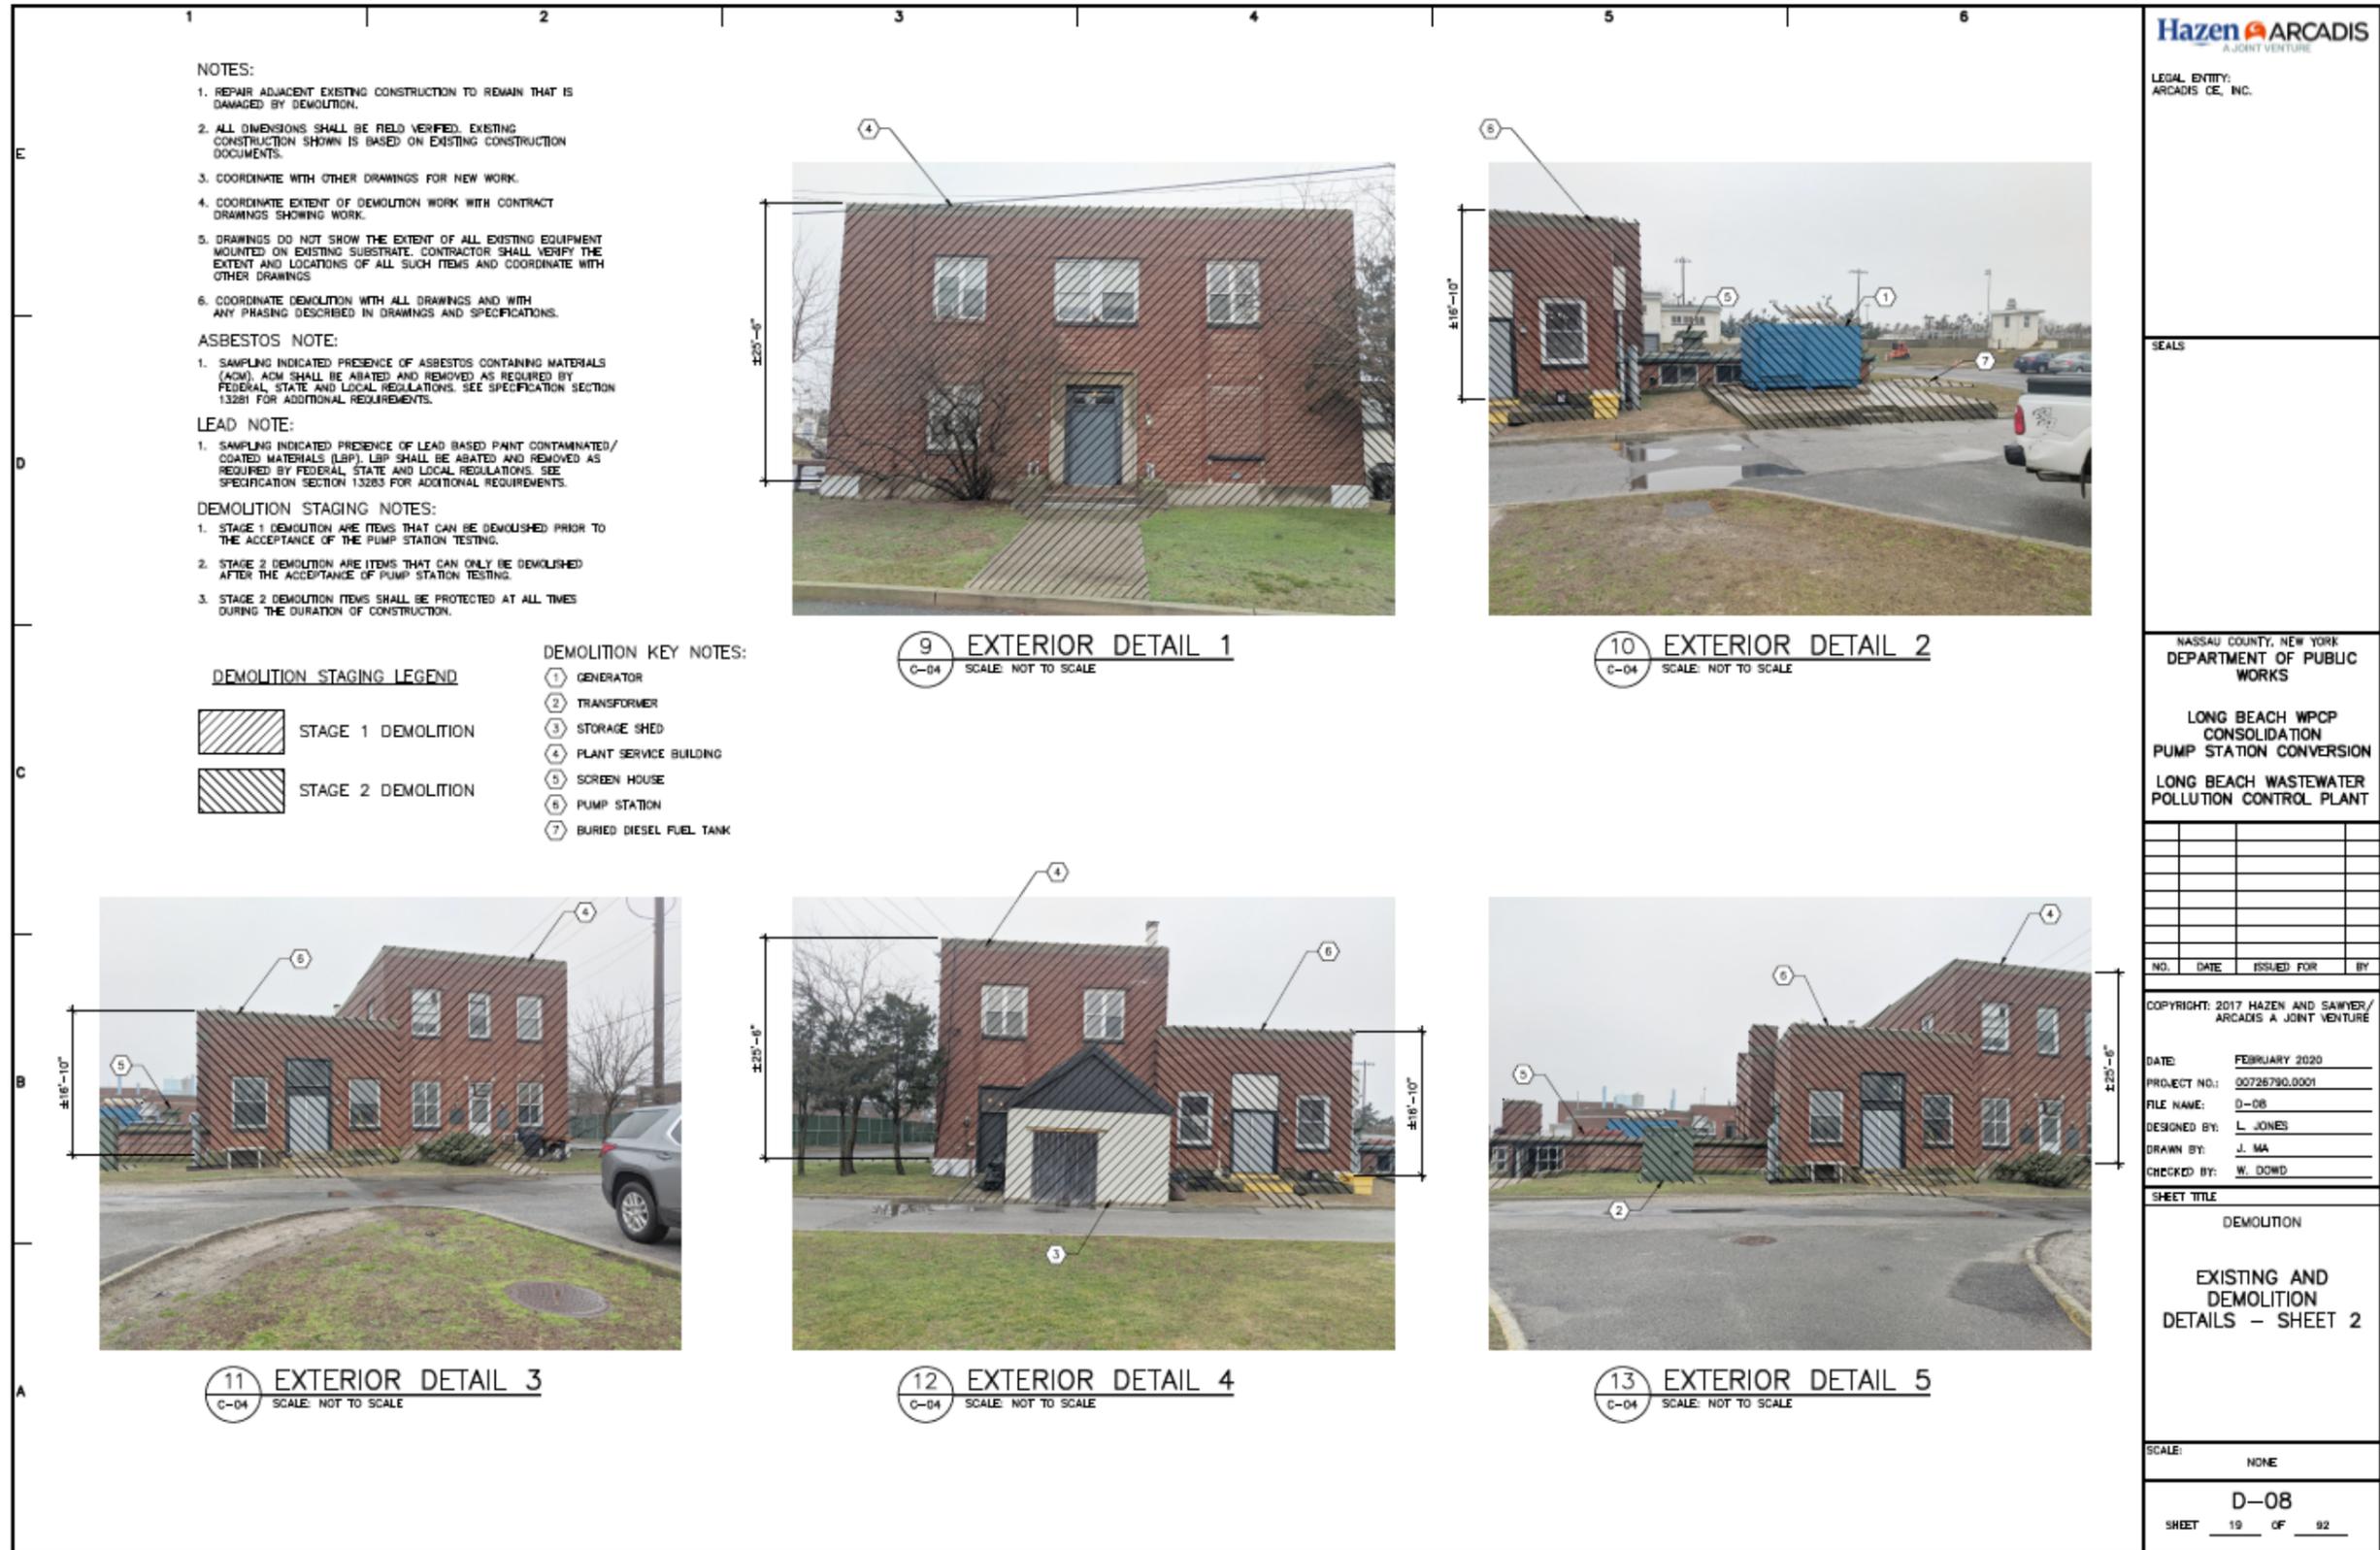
Existing Long Beach WPCP and Exterior Demolition Details
